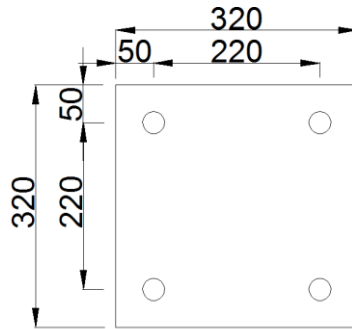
Geometry for anchor plate and spacing between anchors.
